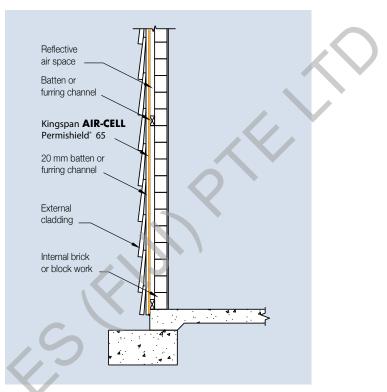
Side elevation of Kingspan AIR-CELL Permishield<sup>®</sup> 65 in a reverse brick veneer wall
